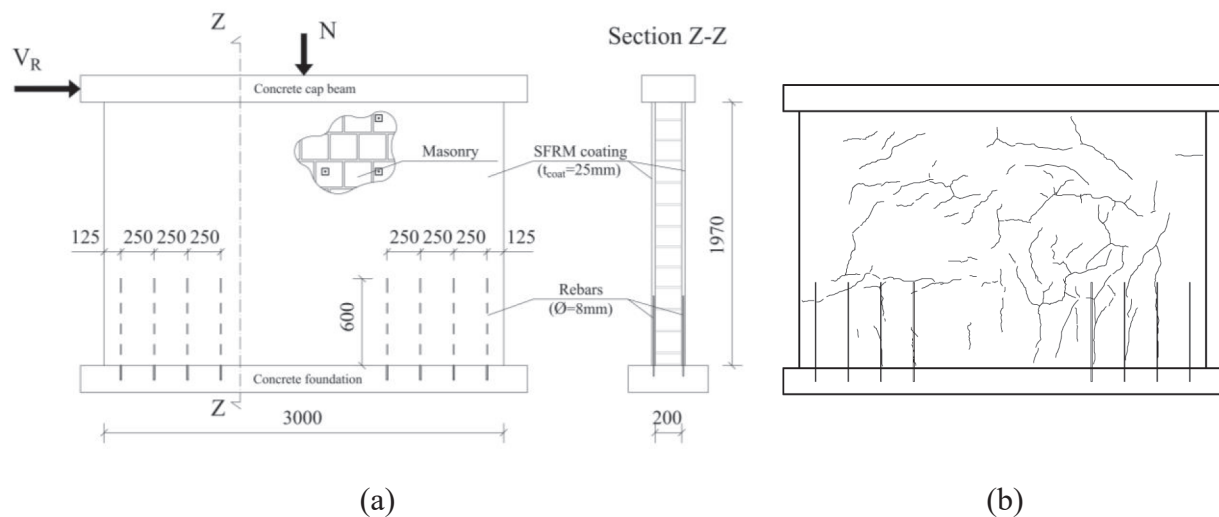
(a) Wall #67 details and (b) experimental crack pattern at failure. (dimensions in mm).
